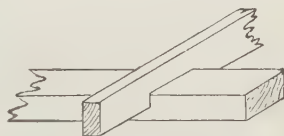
Joists notched out to Wall Plates, ends left on full depth.
